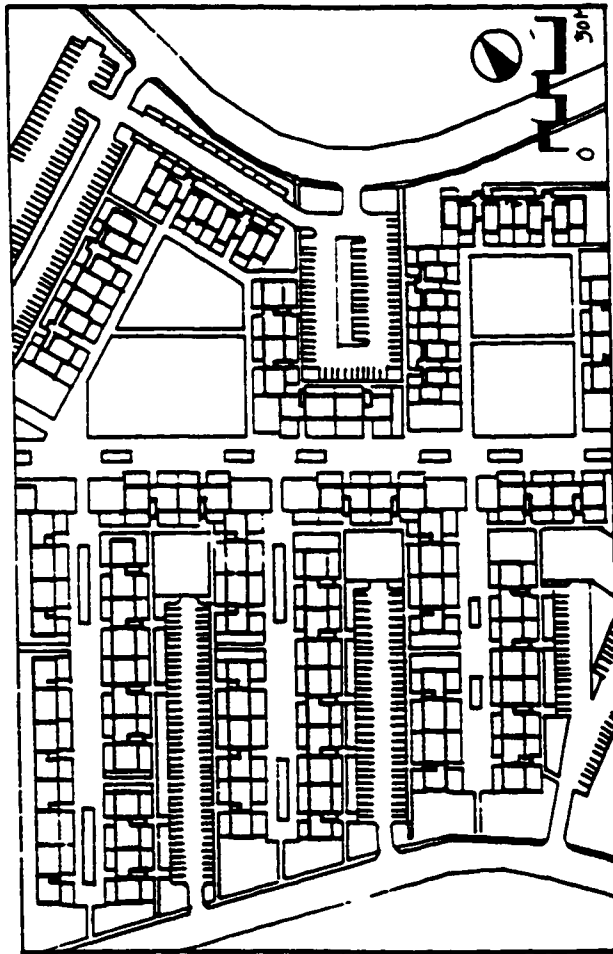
Site layout plan of Mokdong-1 apartment complex
